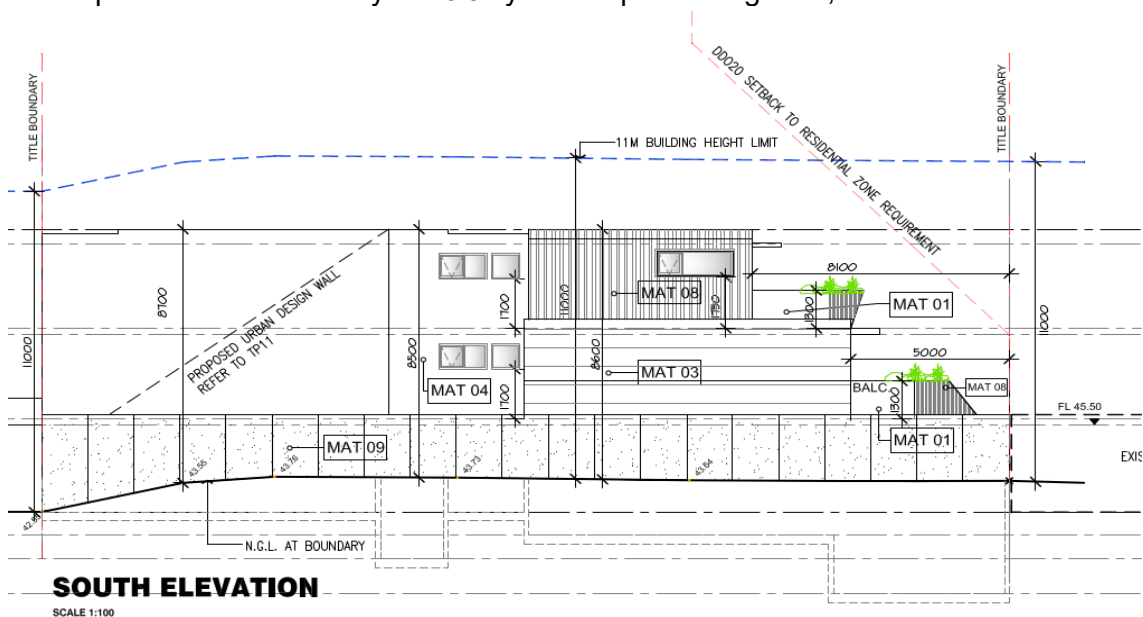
rear boundary building envelope outline under the DDO20 (sketch plans, 6 July 2021).
